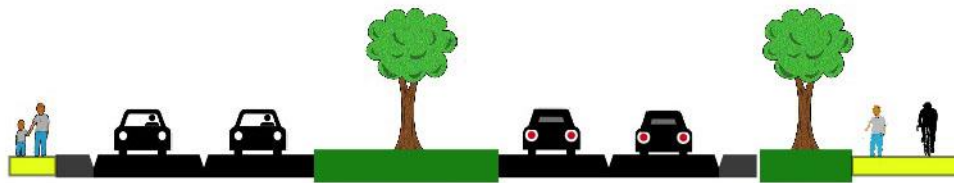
YARMOUTH ROAD PROPOSED CROSS SECTION (LOOKING SOUTHERLY)
